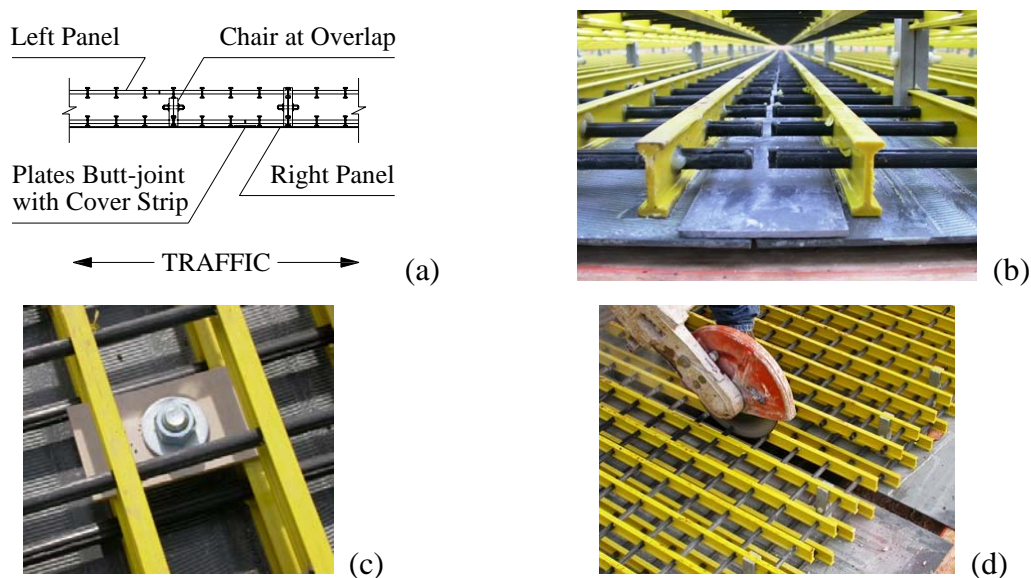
Deck reinforcement detailing: (a-b) panel-to-panel connection; (c) anchoring to girder; and (d) end panels at expansion joint.
